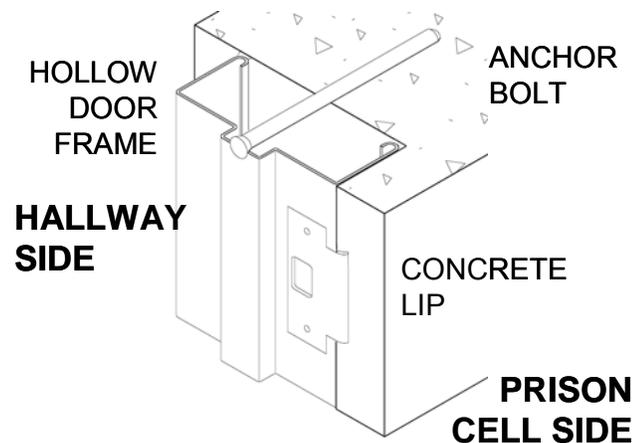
Concrete Lip Fix (image by Padgett 2003)
